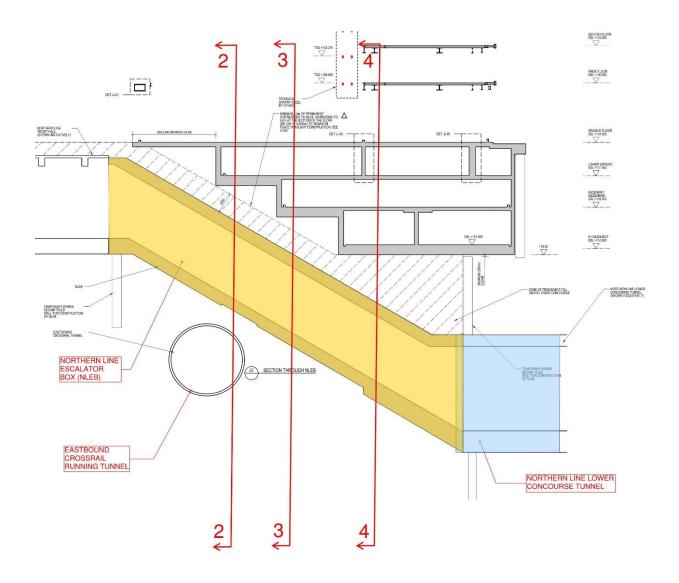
Elevation of modelling sections through NLEB (Appendix P).
